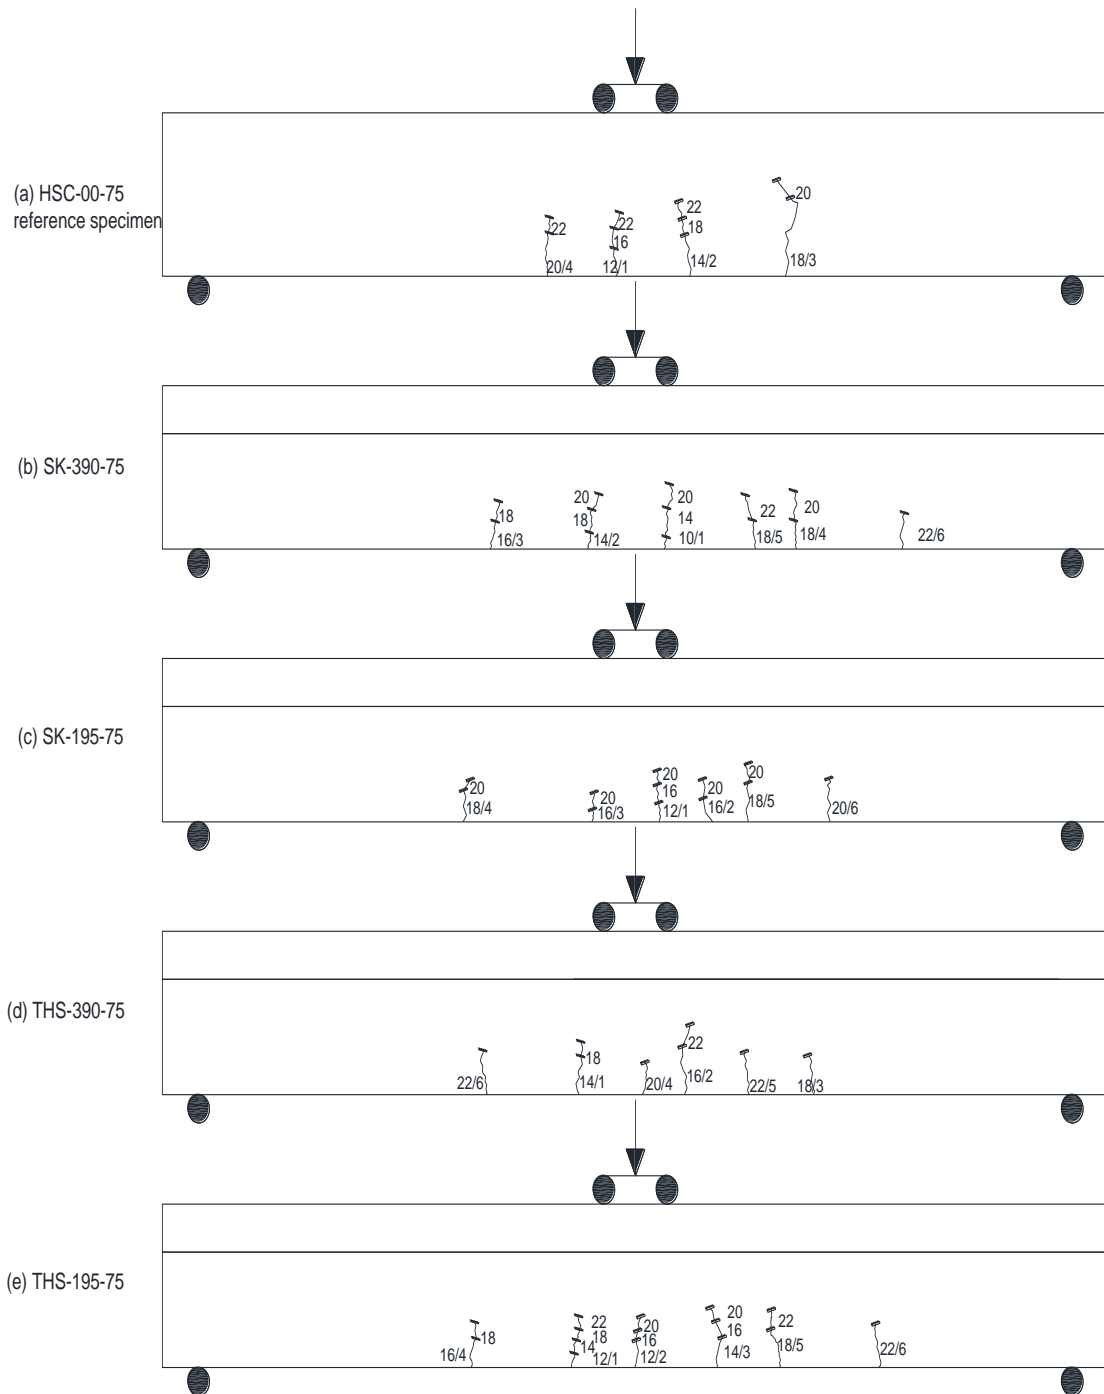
Crack patterns at service load (22 kips) for the specimens with a 75 mm top layer.
